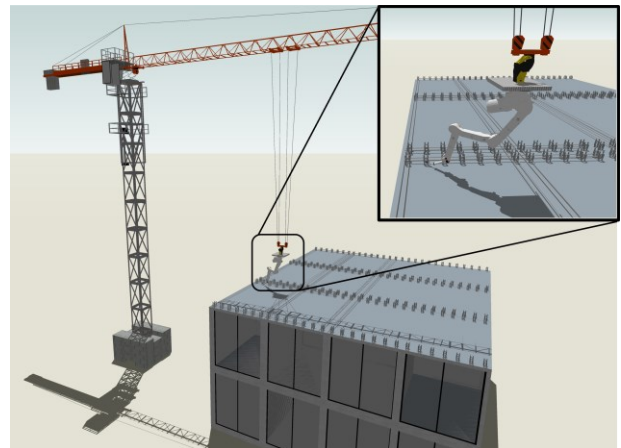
The robotic arm is mounted on a cable-driven platform under the existing tower crane.
